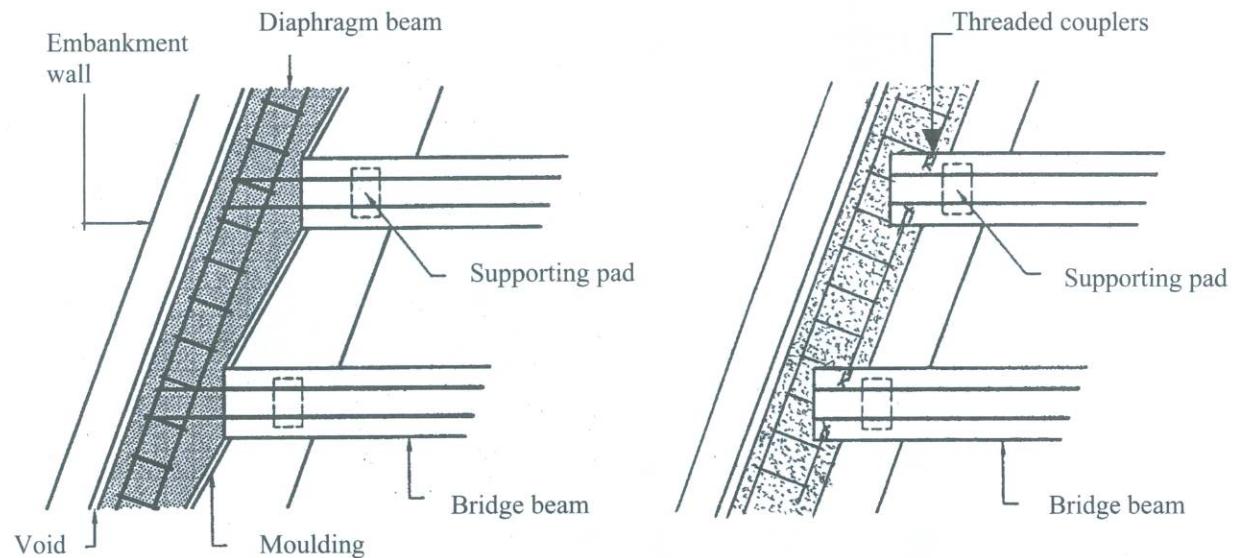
Connection reinforcement between precast and cast in-situ concrete
